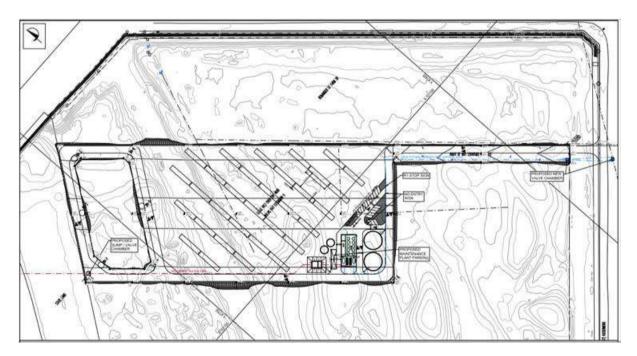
Site (platform) layout of the Walvis Bay Desalination Plant, including preliminary solar panel layout.
